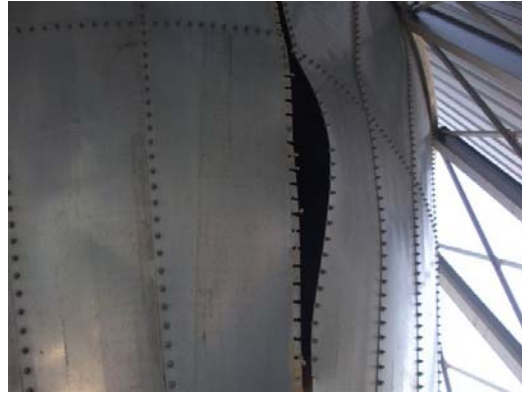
Progressive Failure of a Bolted Joint on a Silo Cone Involving Shear-Out of the Bolt Holes in Thin Sheet
